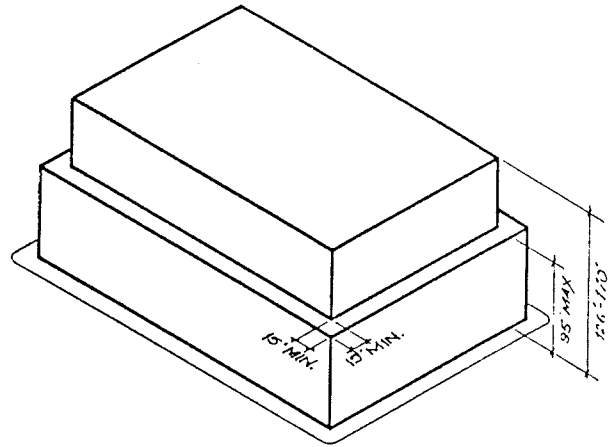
A MINIMUM FACADE HEIGHT
